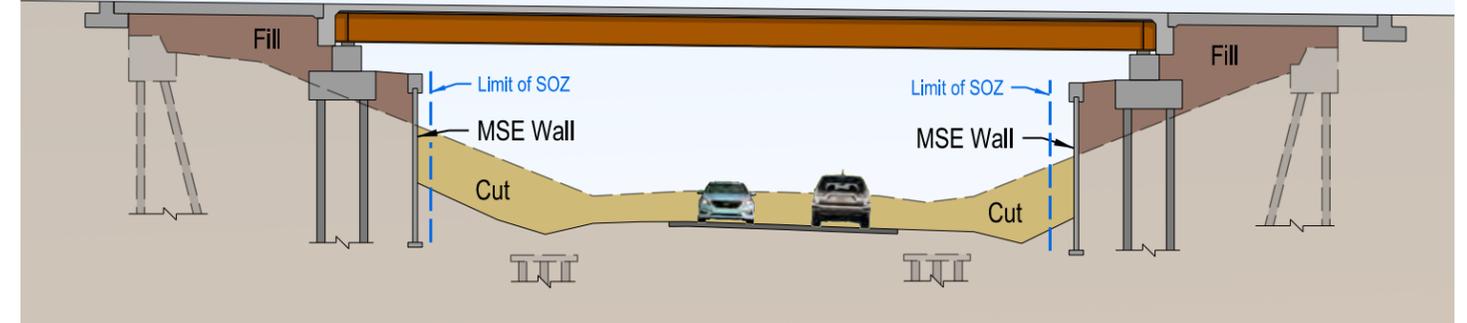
| Bridge Elevation Section Views
